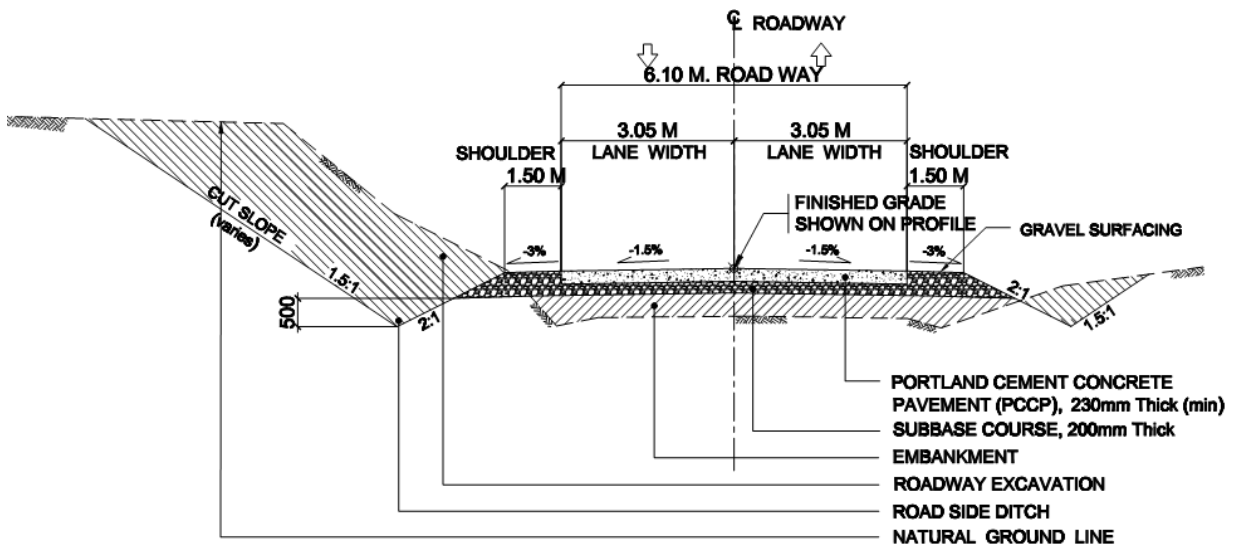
TYPICAL ROADWAY CROSS-SECTION FOR EXISTING ROADS
